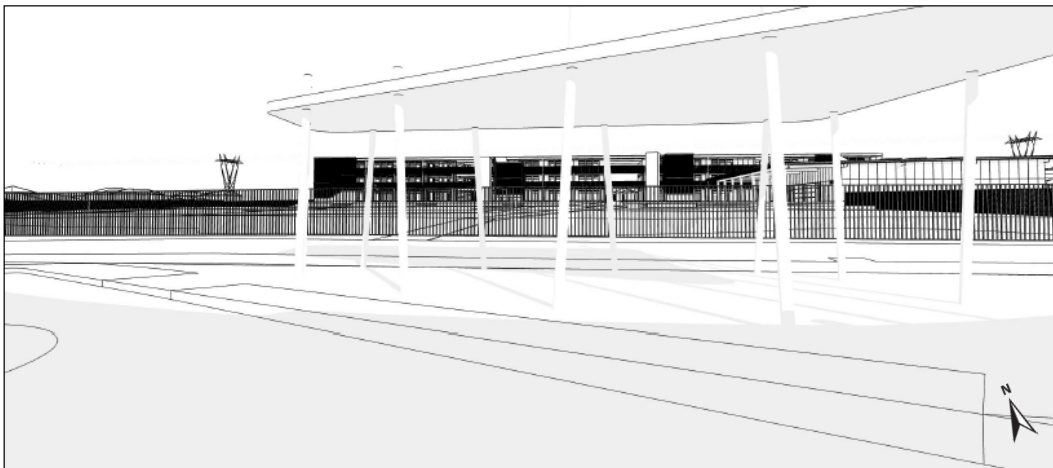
Proposed view looking east from Howard Park (Source Bennett and Trimble) Not to scale
